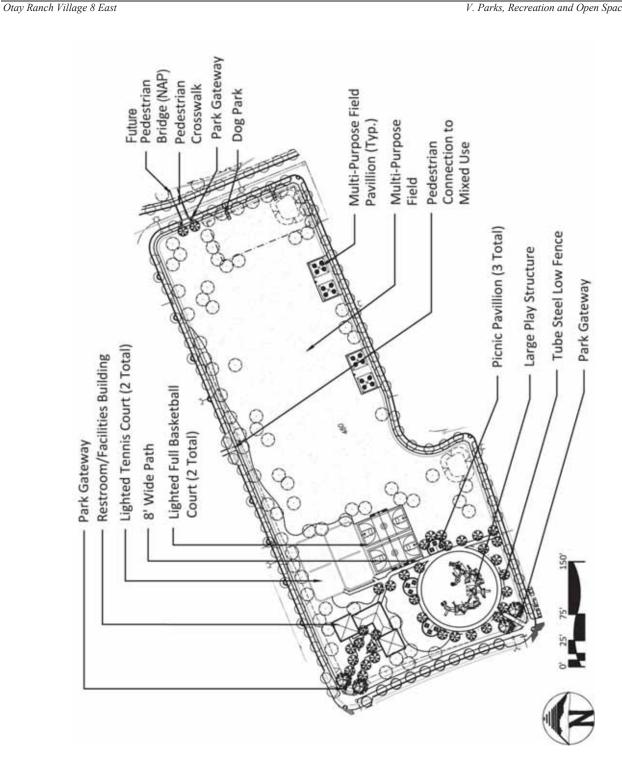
Neighborhood Park (P-1) Concept Plan
